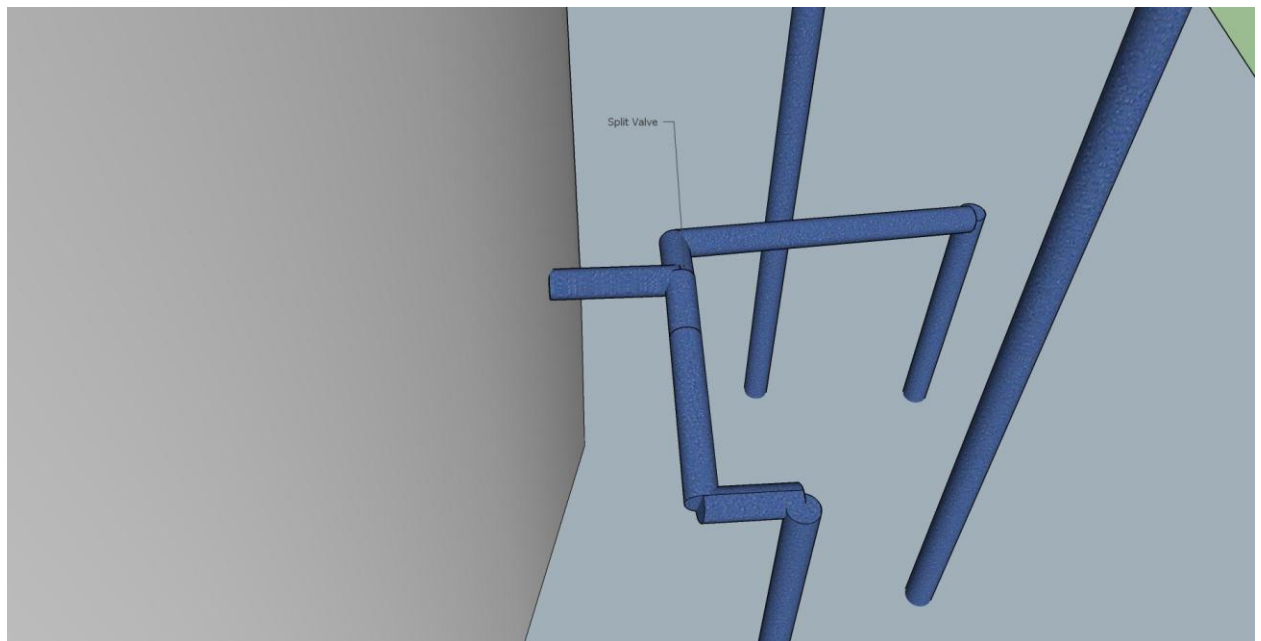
Lower connection, also a split tube. This could also be a standard valve and you switch the piping out.
